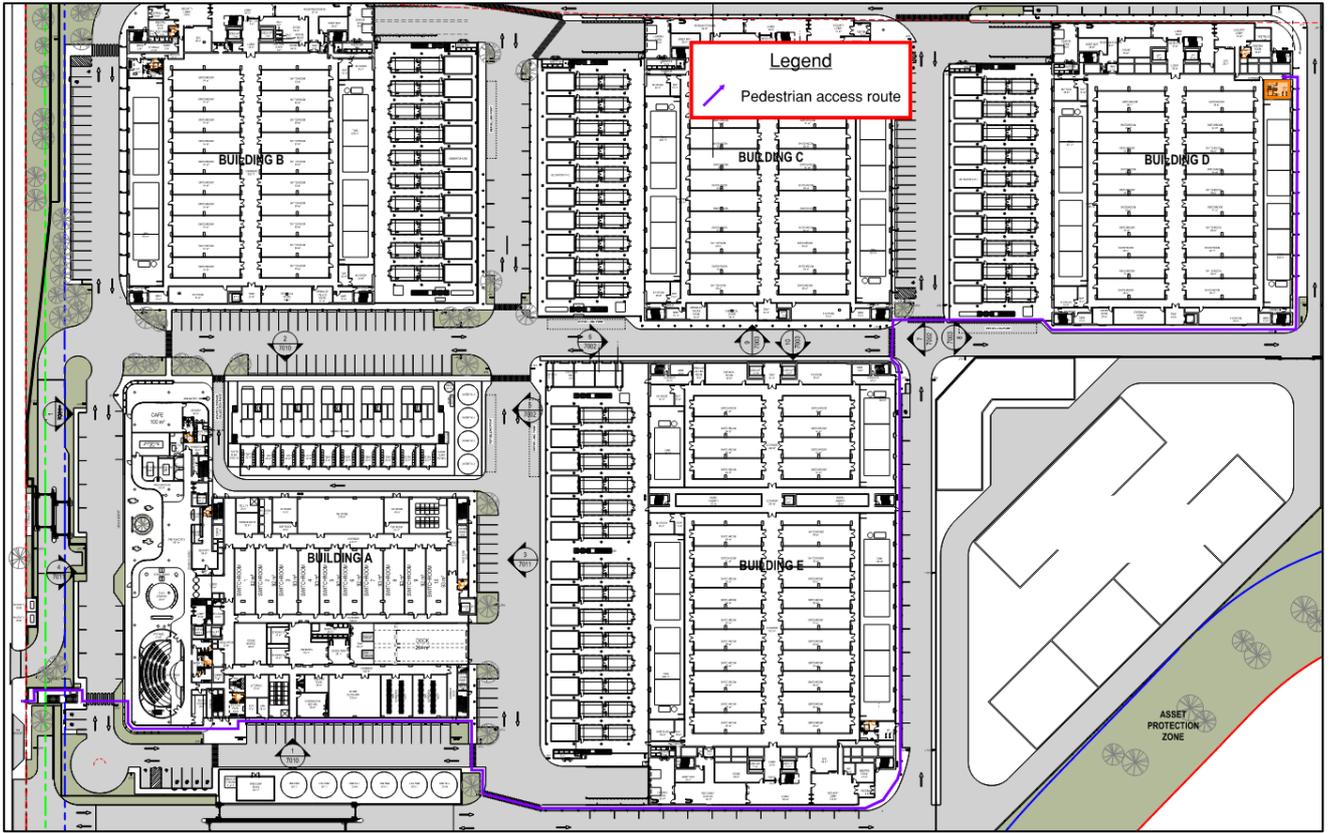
Building D – Proposed End of Trip Facilities and Pedestrian Access
